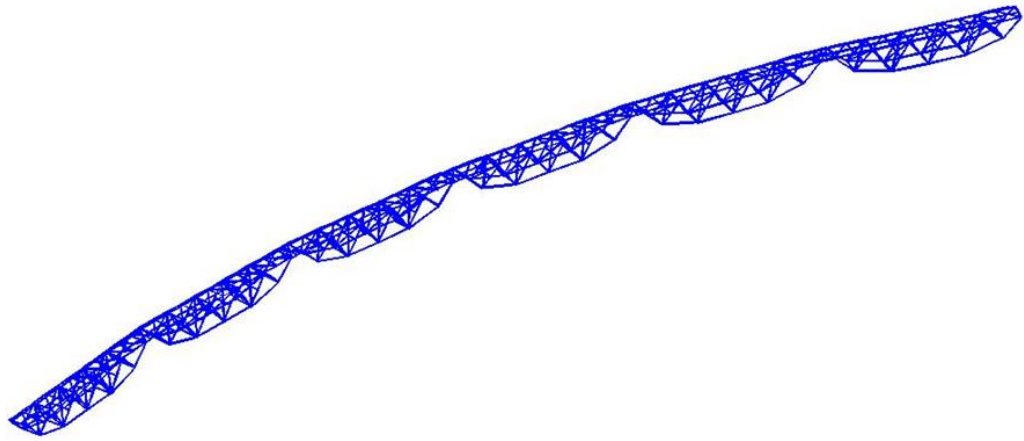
199 + 325 steel railroad bridge FEM with spring elements
